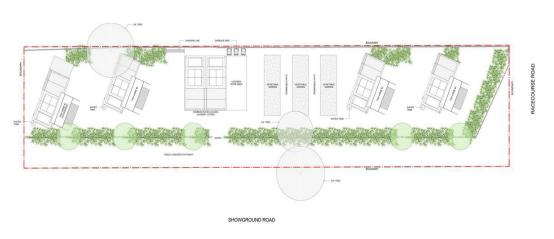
Site Plan of the Tiny House Foundation pilot project designed by NBRS Architecture
